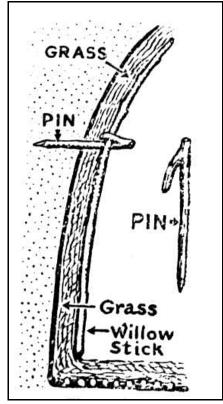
Detail of Hidatsa Storage Pit SOURCE: Wilson 1917:90
